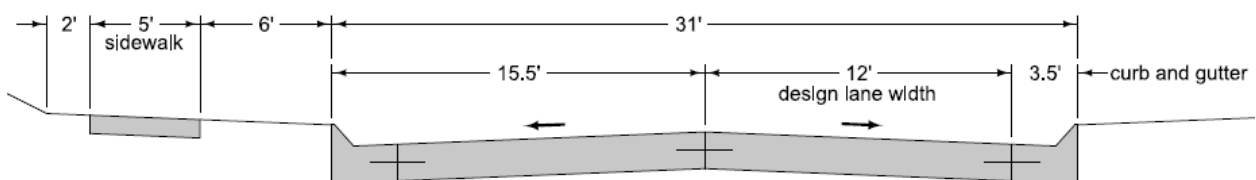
2-lane urban roadway with standard paver width of 31 feet.
